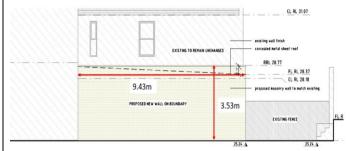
Annotated North-West Elevation showing height and length of the wall
